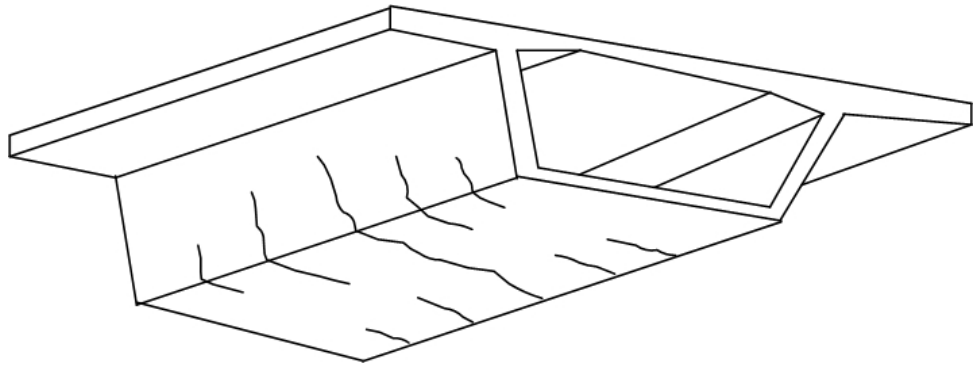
Box Girder Cracks Induced by Flexure (Positive Moment)
